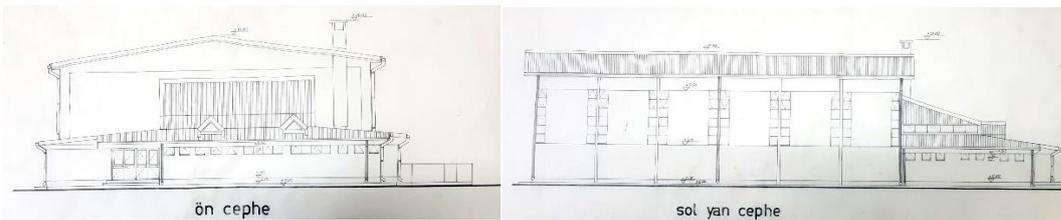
The elevation drawings of the sports hall (Source: TTK Archive, 2020)
